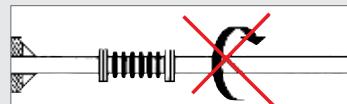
Axial thrust in a pipe with an axial expansion joint
